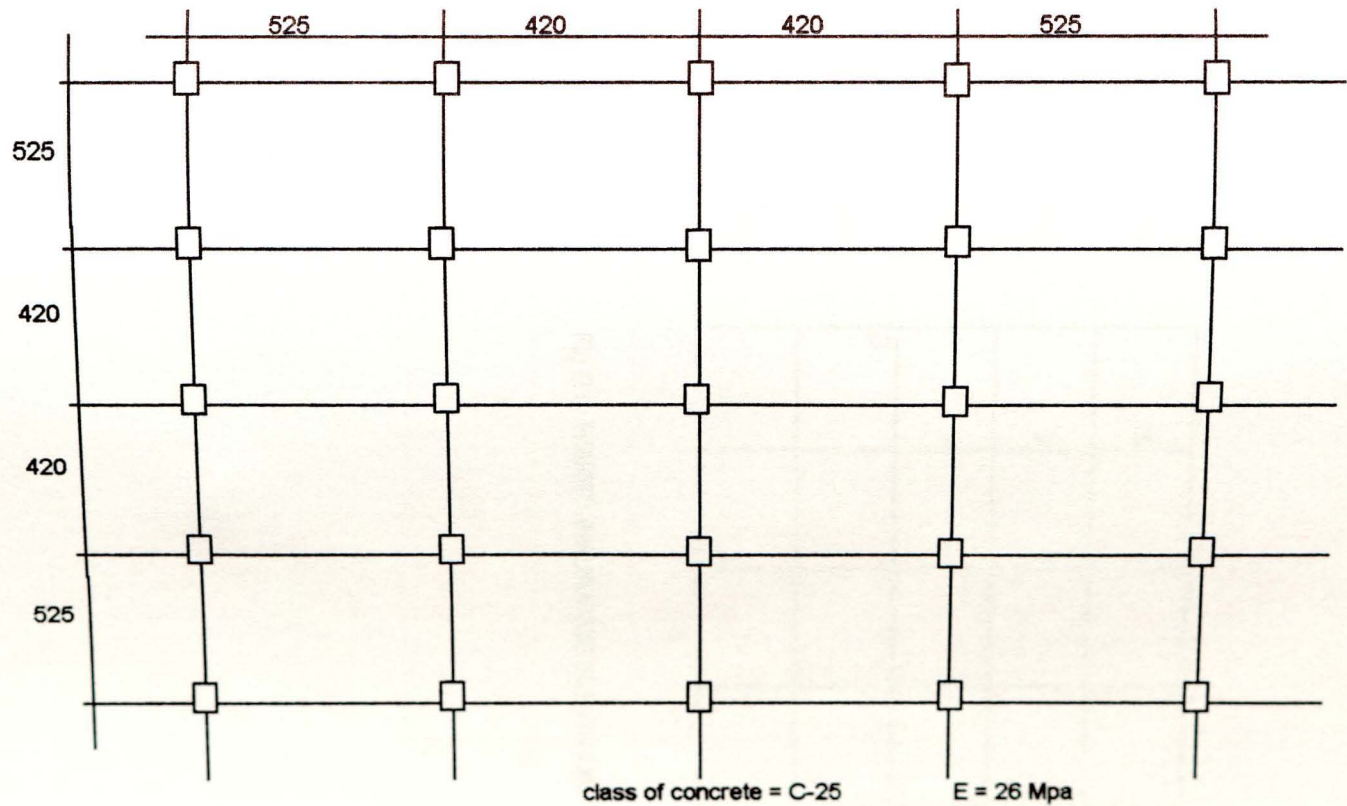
HIBRET INSURANCE AND OROMYA ADMINISTRATION BUILDING FLOOR PLAN.
